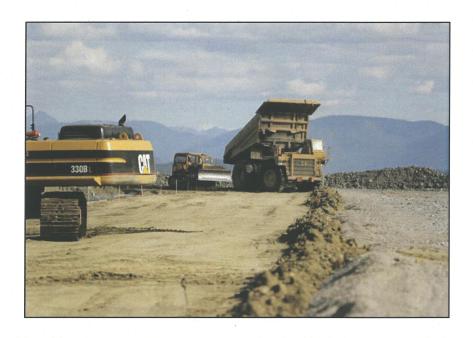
Placing Zone S till material with mine fleet Caterpiller 777's near the end of the construction period
